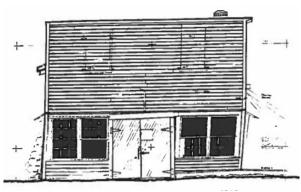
Drawing showing conjectured view of Biggs' Blacksmith Shop after roof and façade alterations (Bouse, 1982)
